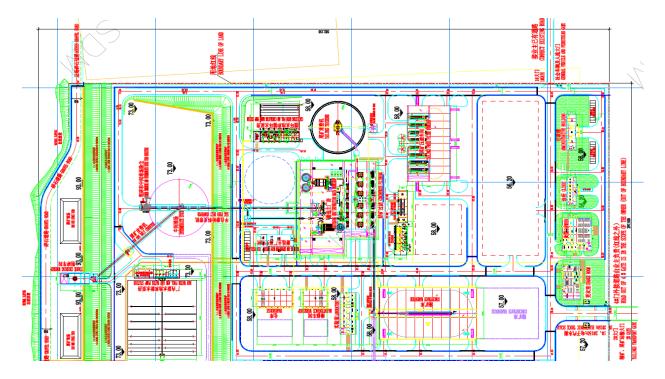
Conceptual Layout Modular Design Concentrator Plant
